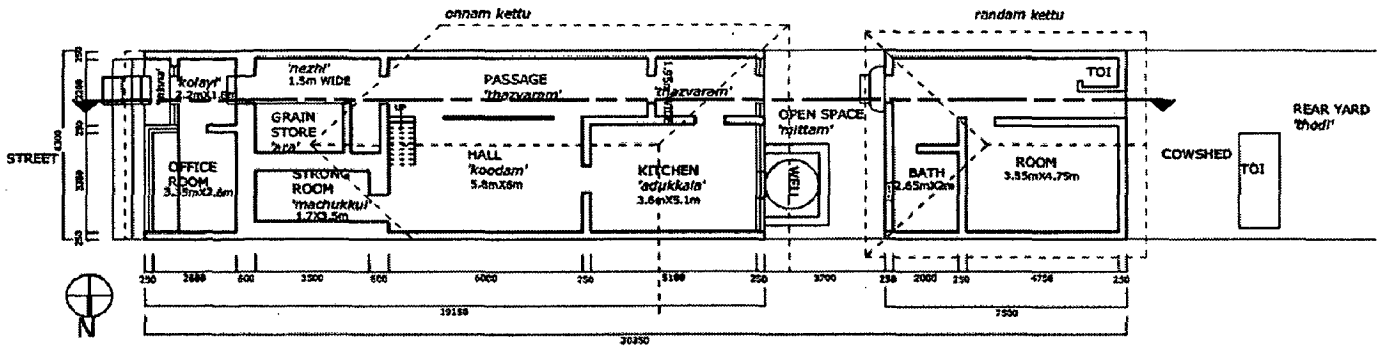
Ground floor plan of residence 1 in Kizhakkencherry Agraharam
